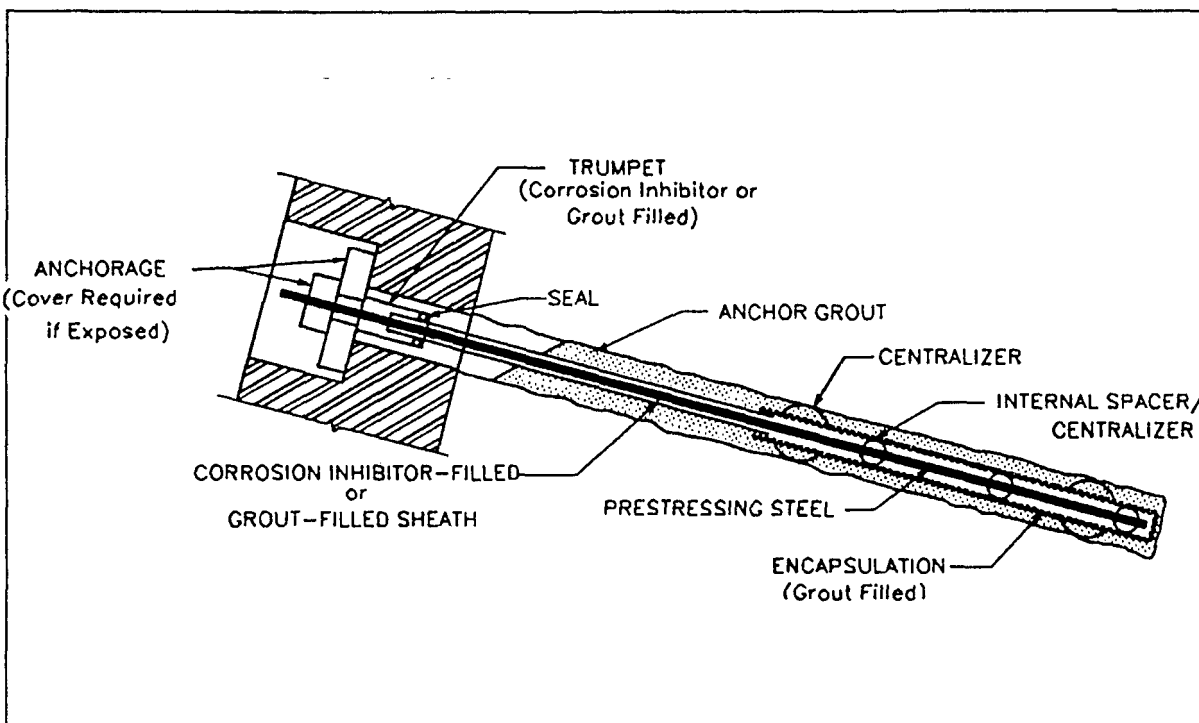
Class I Protection - Encapsulated Anchor (PTI, 1996).
